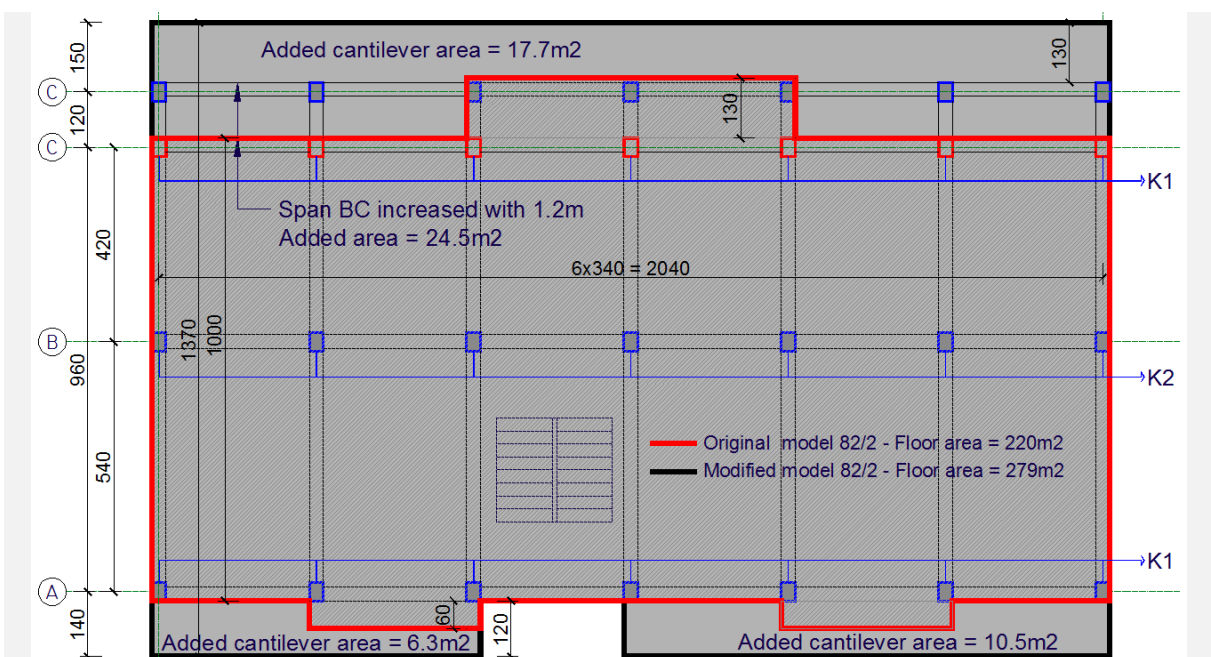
Structural layout of RC Model 82/2: a-) Original model; b-) Modified model
